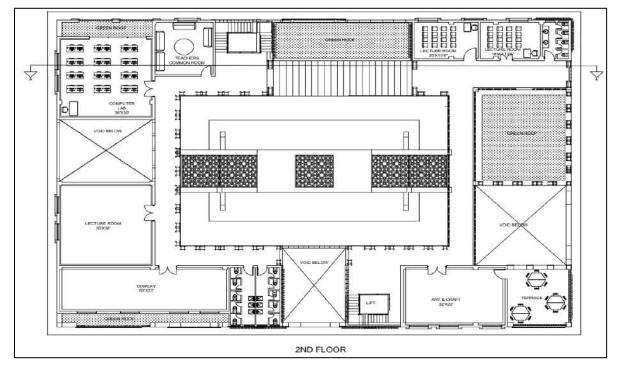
University building top view - Second floor (AutoCad 2022)
